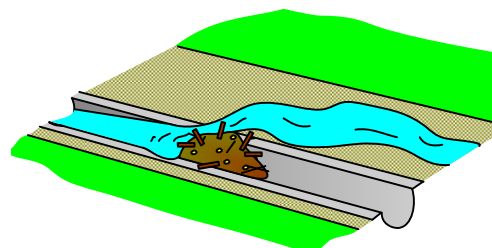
Examples of the surface drainage system and open-blind ditch in Chitrakoot (Source: MPI)
